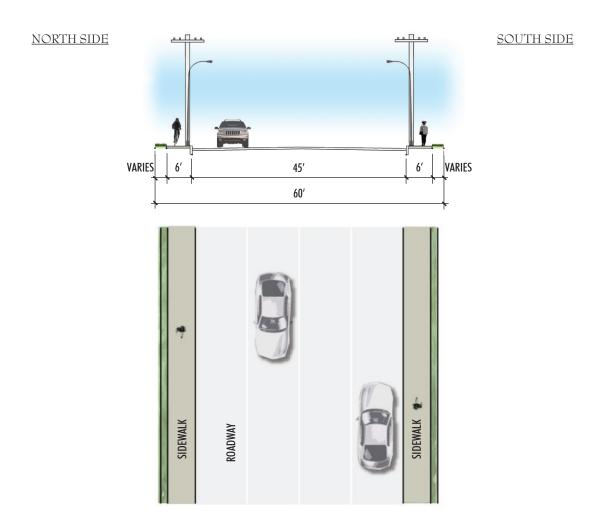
The Hub: Zone 5 Existing Conditions Section and Plan
